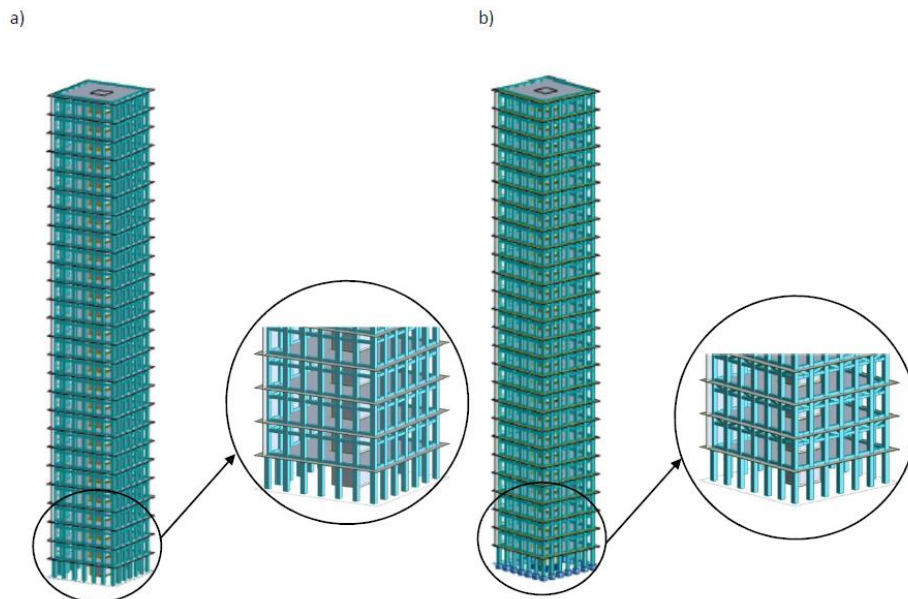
The structure of the analyzed tall building: a) the system with additional beams, b) the system with additional trussing.
